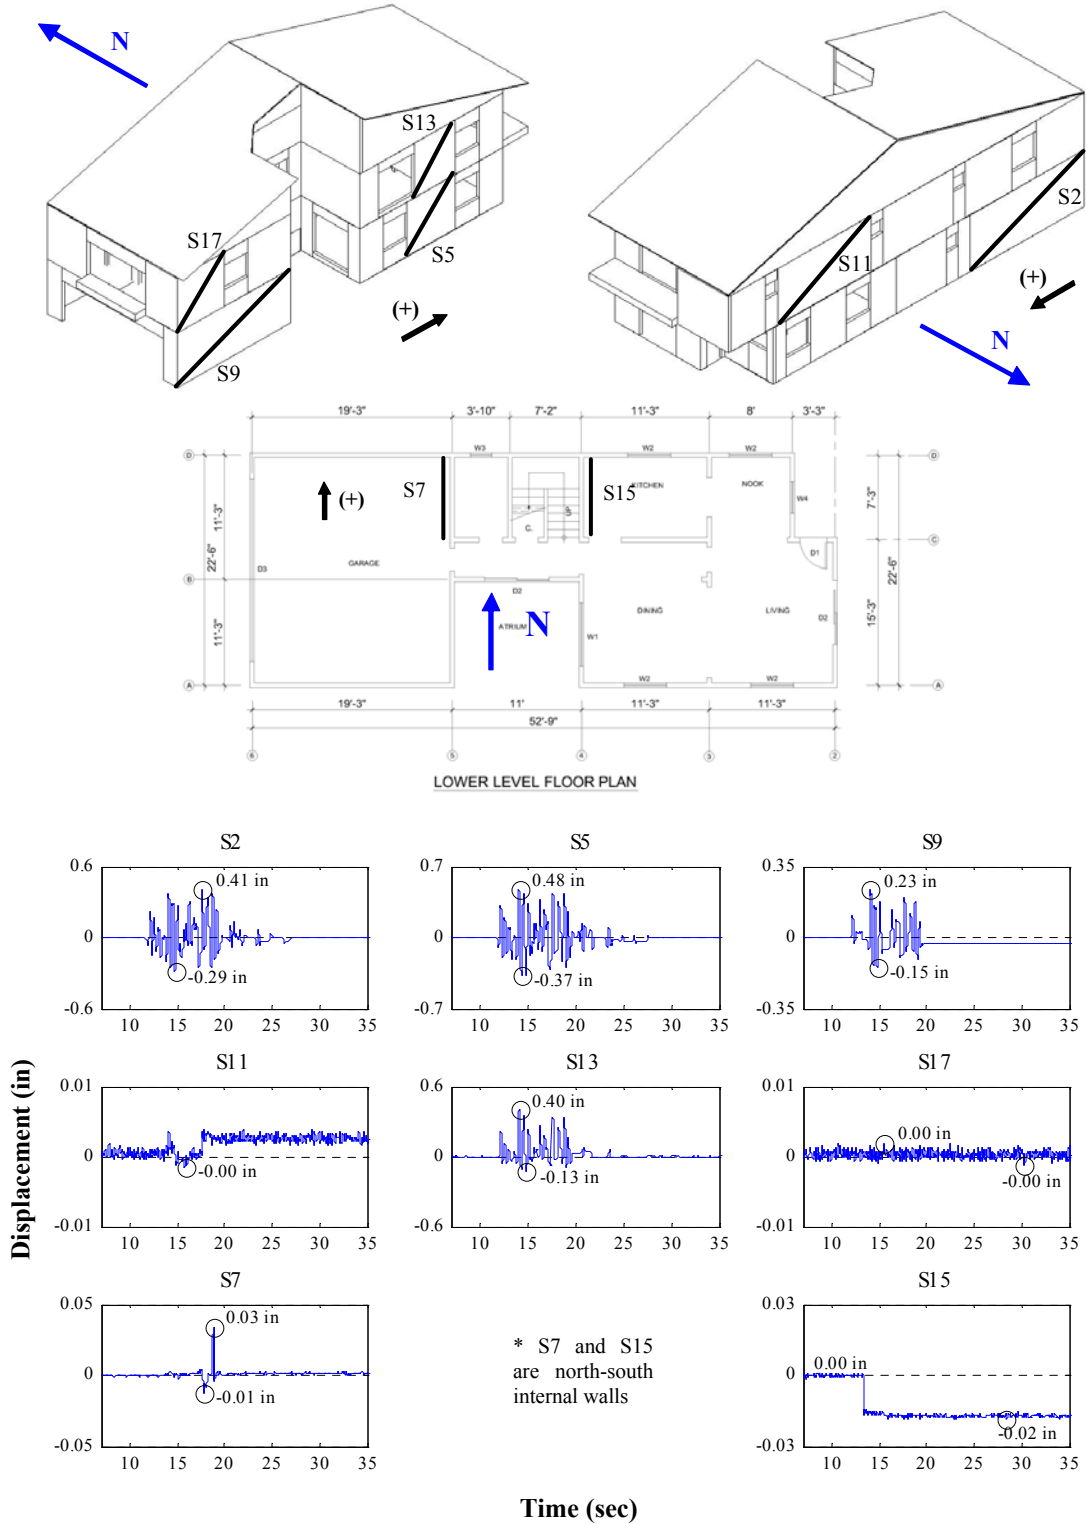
Wall deformations of east-west internal walls for Test NWP2S17
